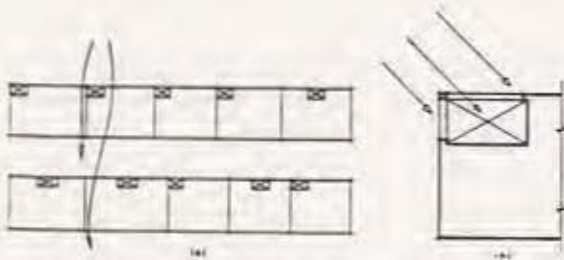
Plan for two rows of houses showing the malqaf or wind catch of each arranged to bring wind to the dwelling (a), and details of a malqaf(b).
